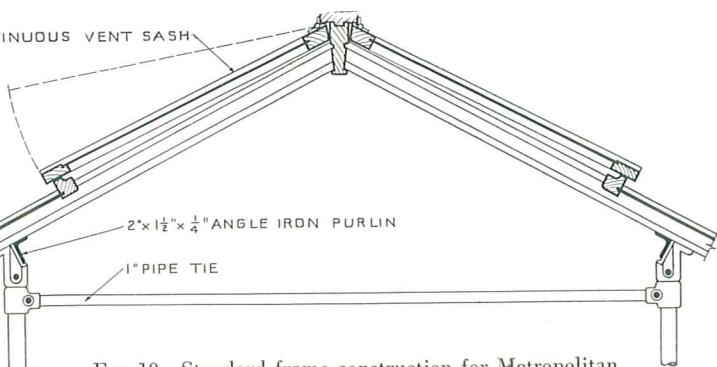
Standard frame construction for Metropolitan Semi-iron-frame Greenhouses of the low-eave type with stationary glass showing section and details at posts with wooden eaves and sills on concrete wall.
